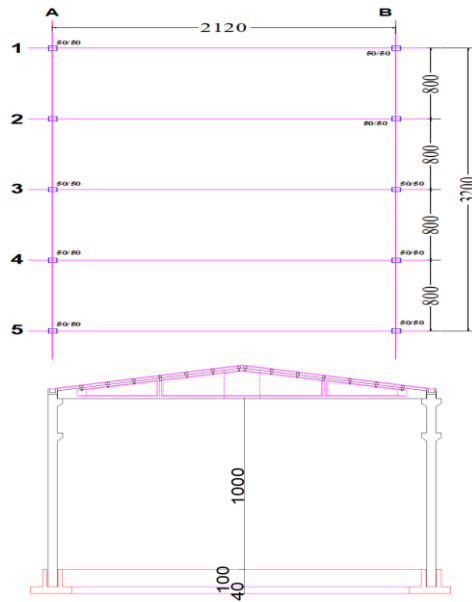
The plan and frame section of the industrial building (dimensions are in cm.)
